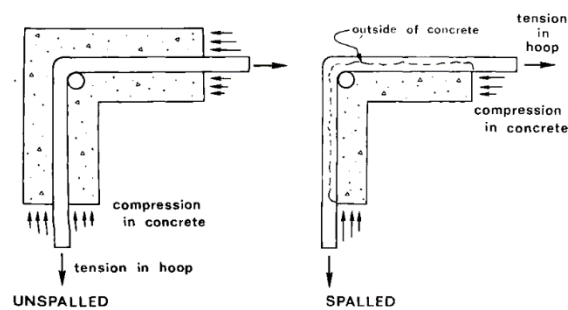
1974, B. Mitchell, M. Collins, *Spalling of concrete cover
